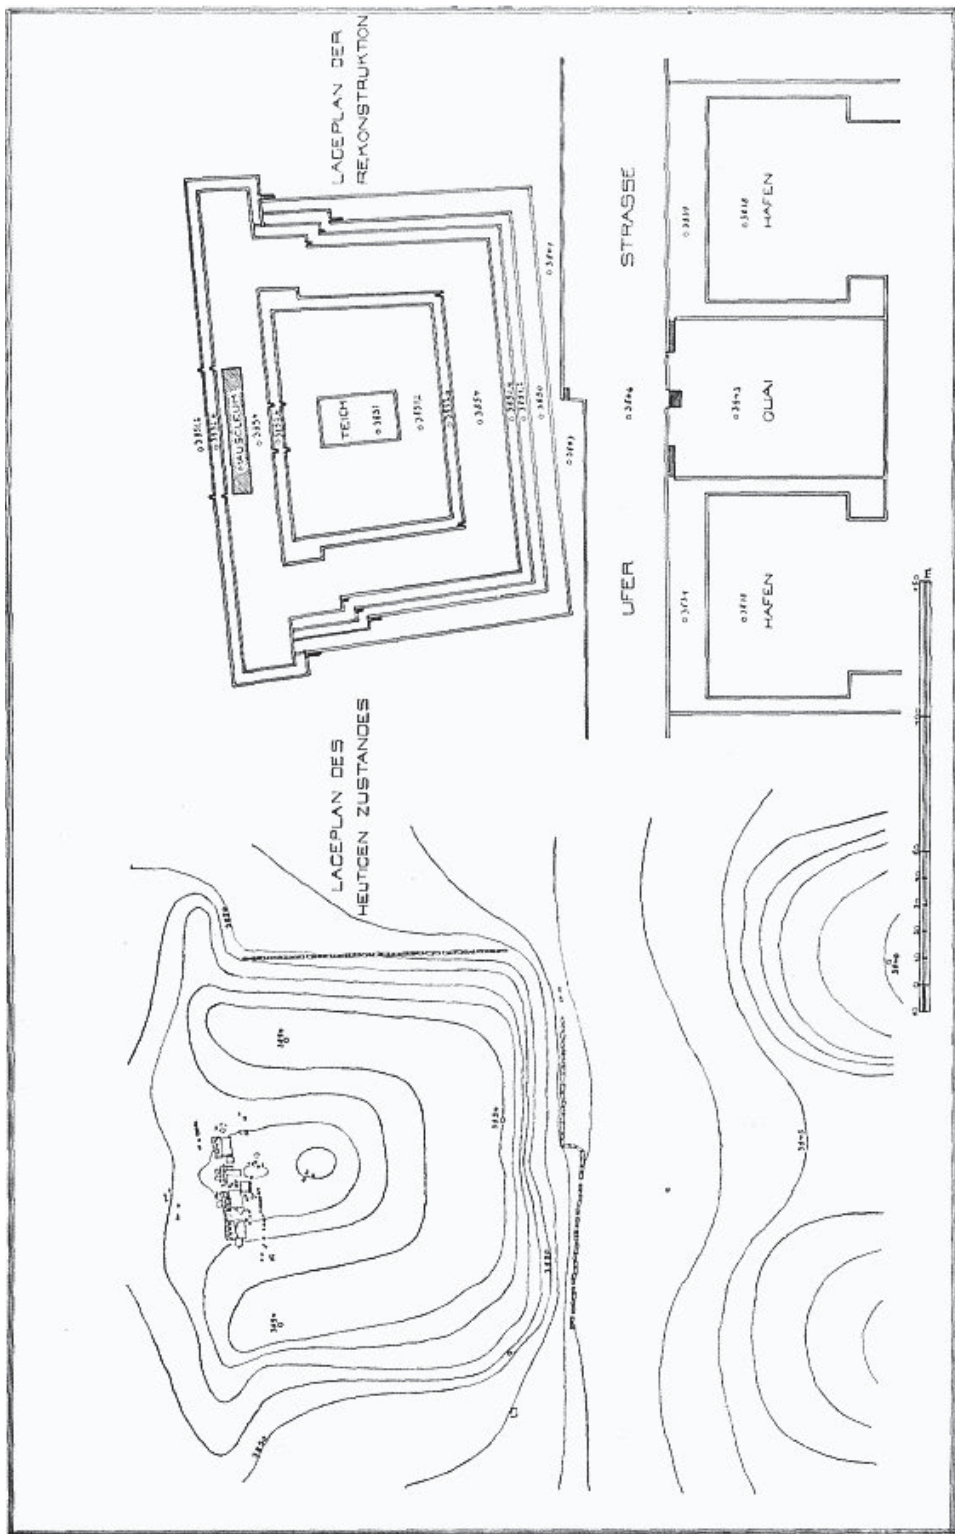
Site plan of the Puma Punku mausoleum and its two harbours. Site plan based on photographs by Professor Arthur Posnansky in La Paz. Reconstruction of the site on the right.
